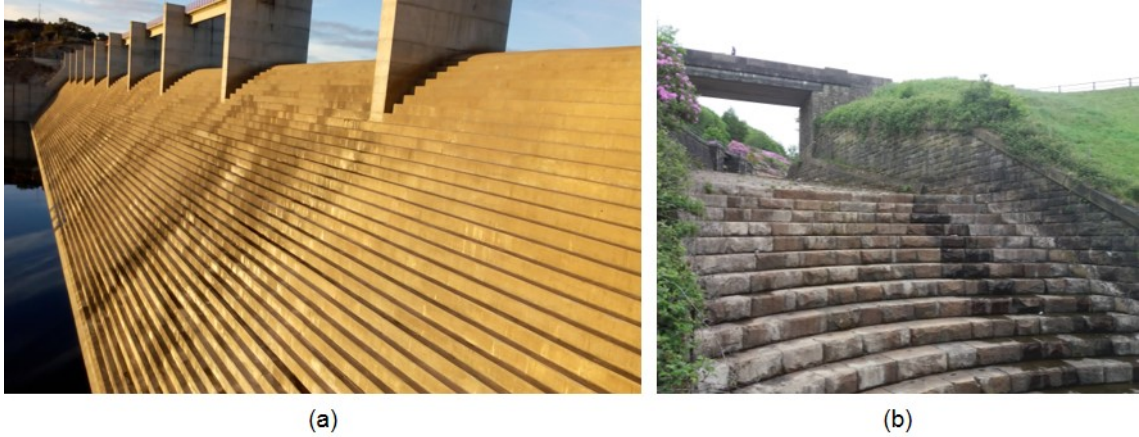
(a) Concrete stepped spillway at the Pedrógão Dam in Portugal. (b) Masonry stepped spillway at Bottoms Reservoir in the UK
